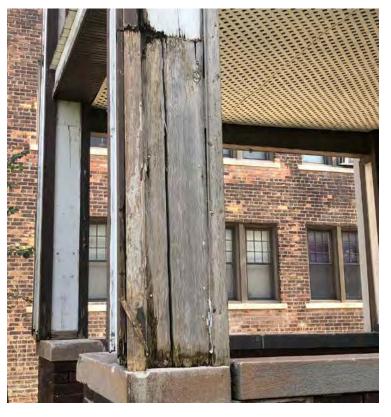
# PHOTOS OF CONDITIONS OF PORCH AND STOOP
